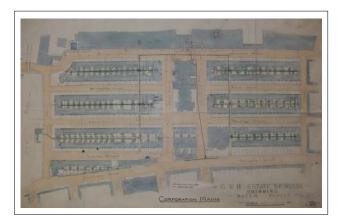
Plan of Swindon Railway Village designed by Brunel and constructed between 1842-1847 (STEAM, 2007).
